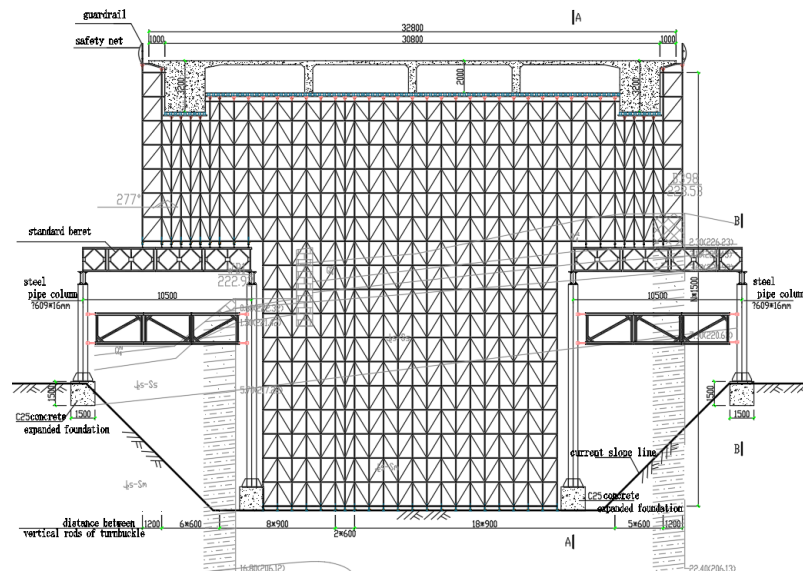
Typical cross section of K0 ~ K2 axis support layout
